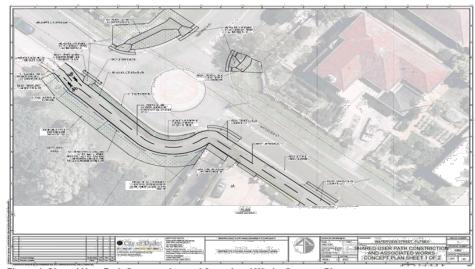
Shared User Path Construction and Associated Works Concept Plan
